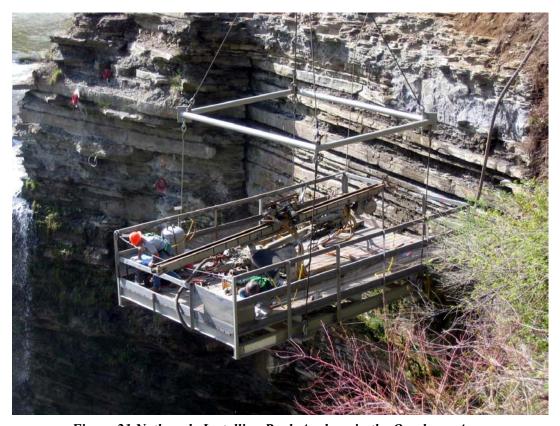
Nothnagle Installing Rock Anchors in the Overhang Area.
